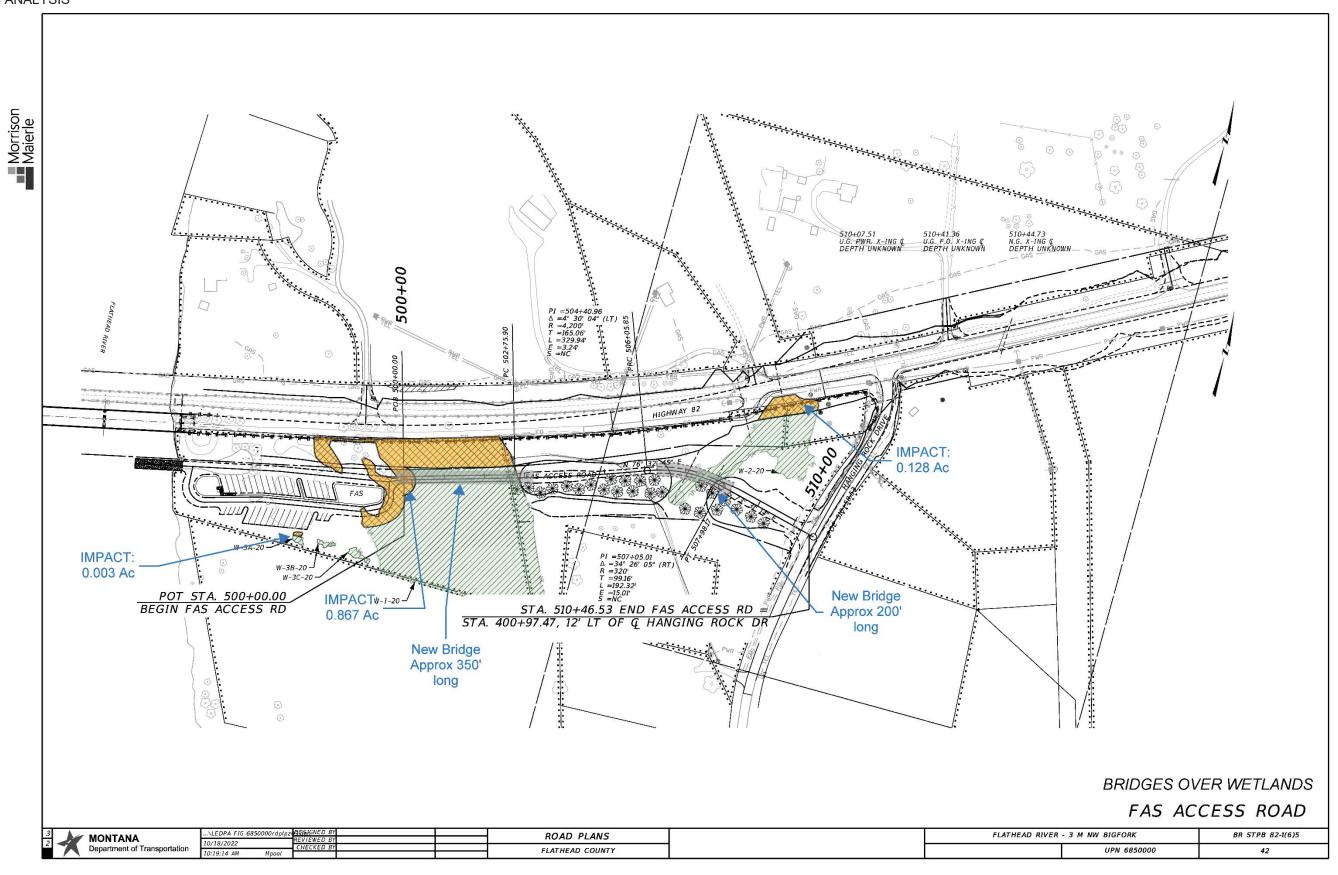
FAS Design Option 4 – Bridge over Wetlands
